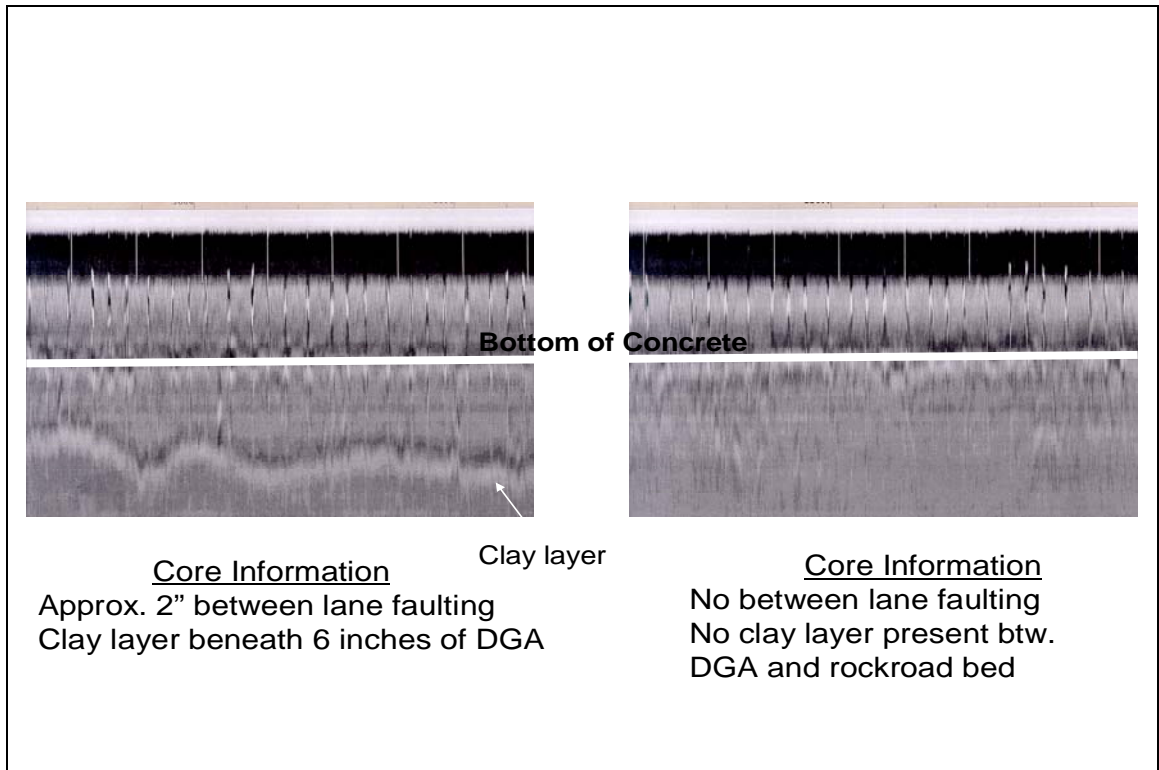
Degree of water beneath pavement 200 ft. section Westbound Right Lane
